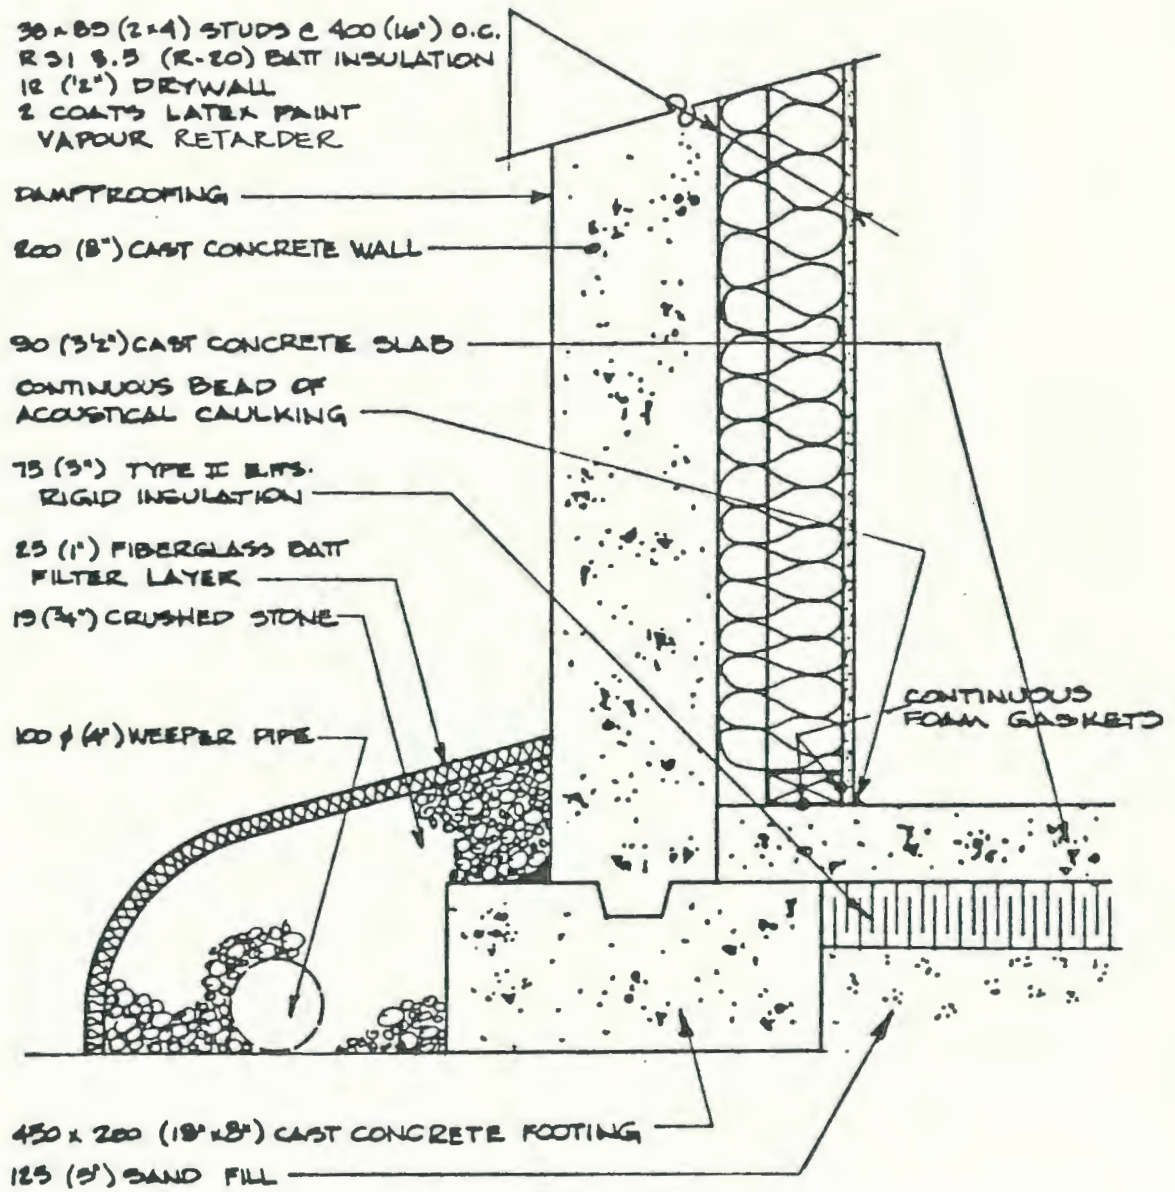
Concrete Footing and Foundation - Alberta Demonstration House
